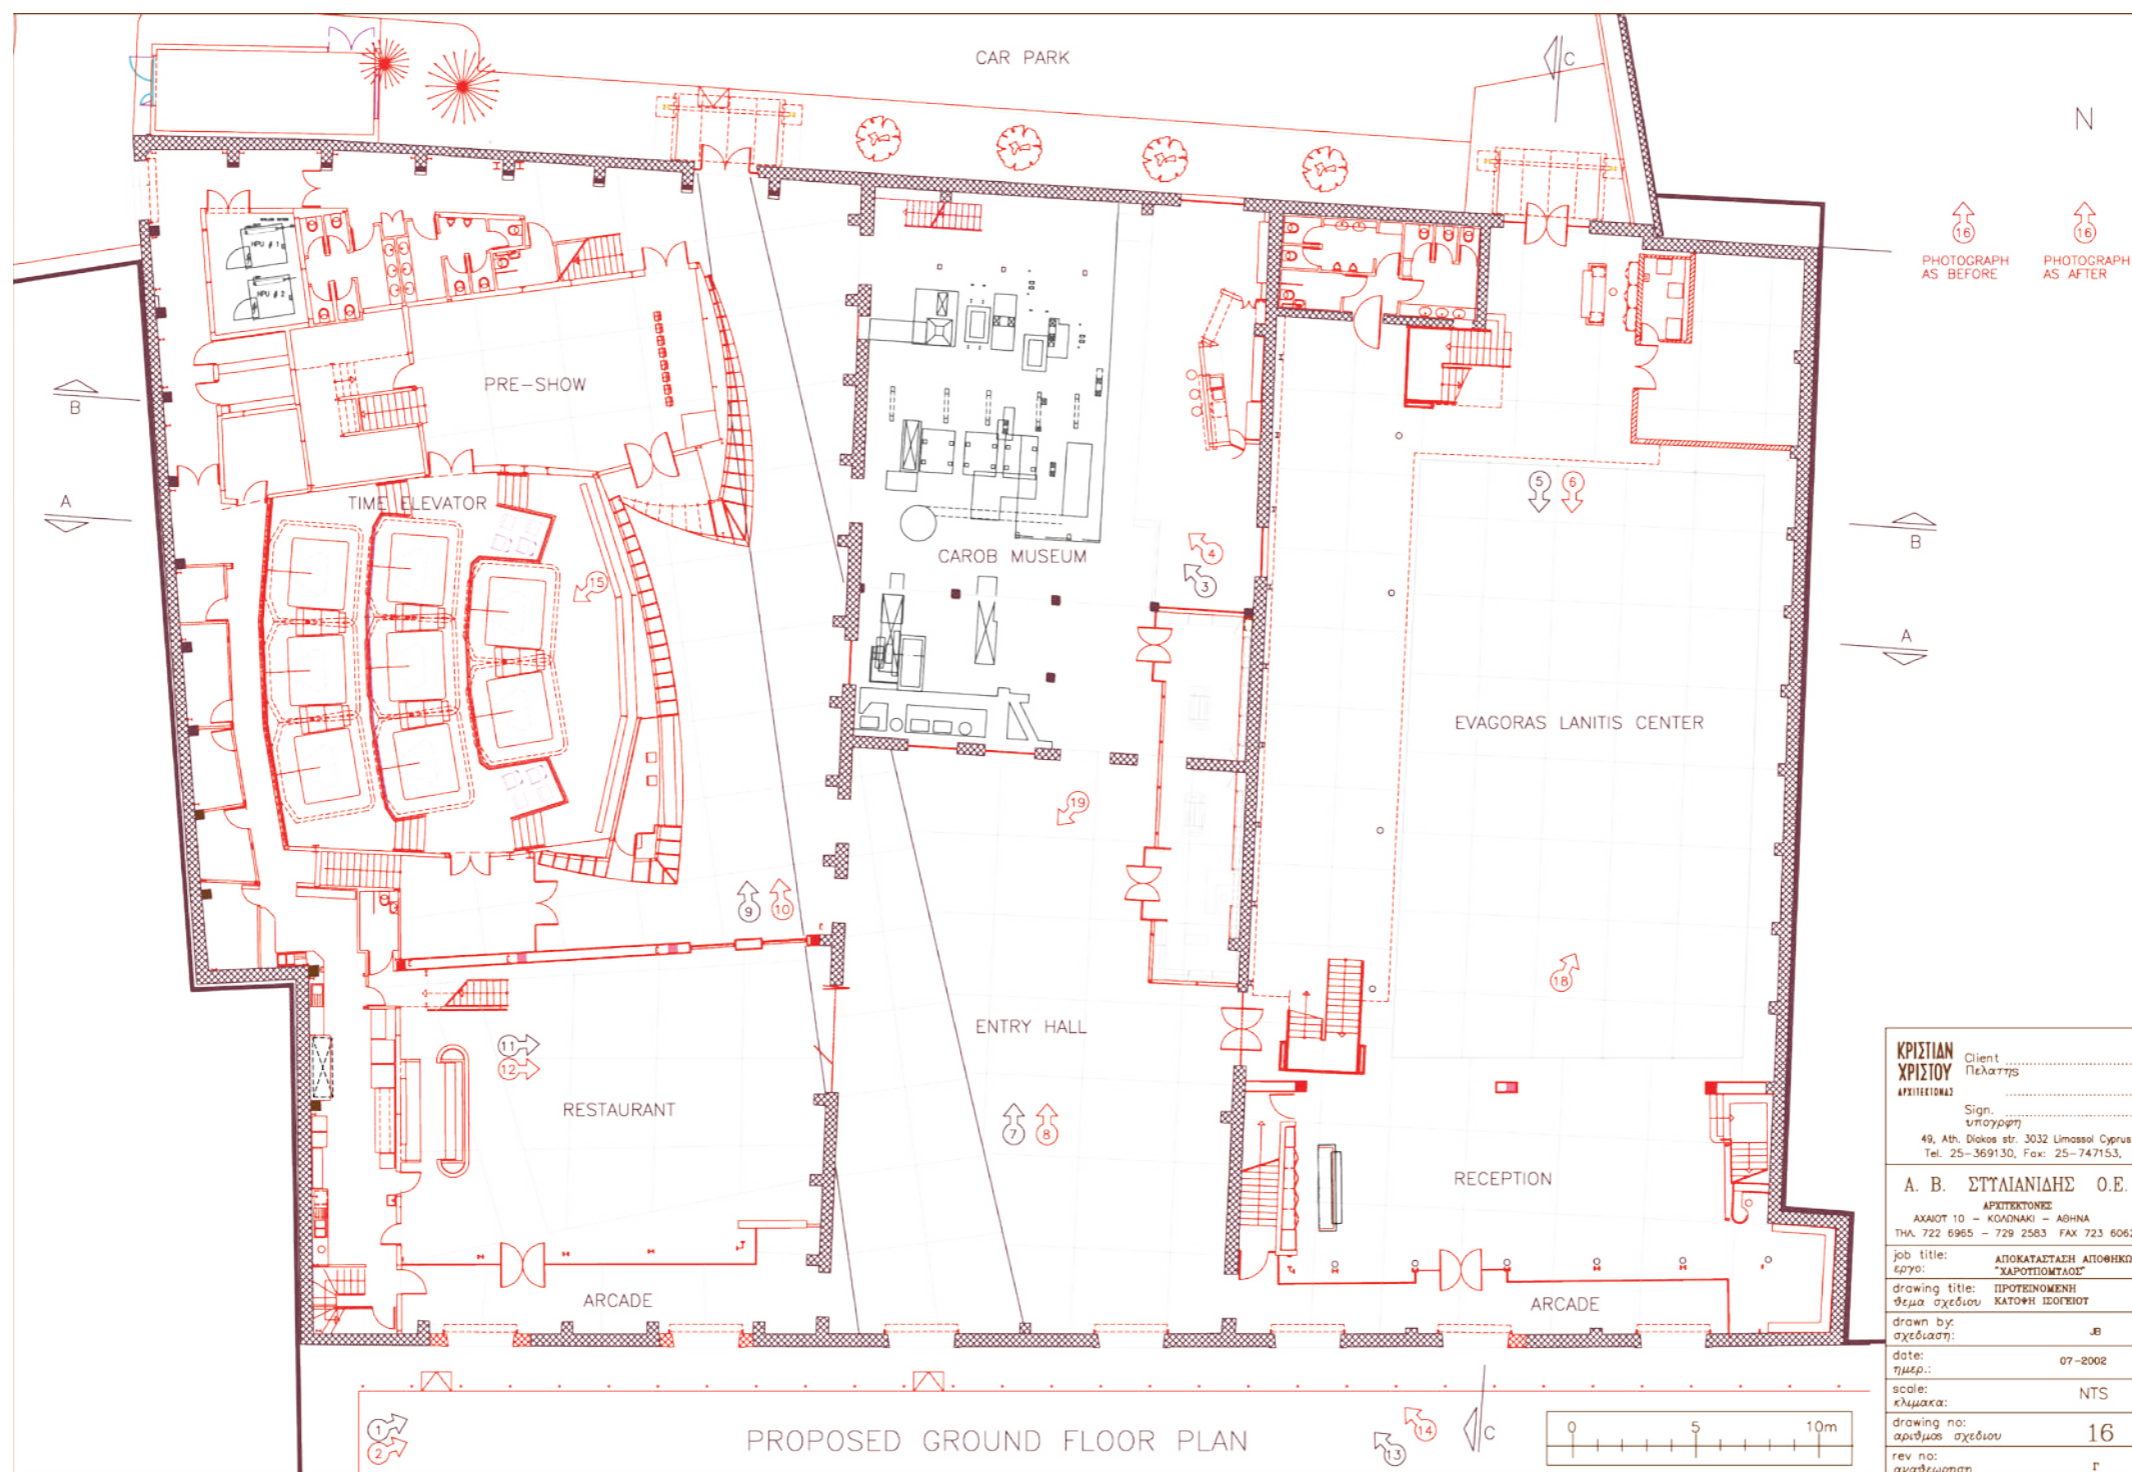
Ground floor plan of the proposed intervention. © Kristian Christou Architects, A. J. Brooks, Architect.
